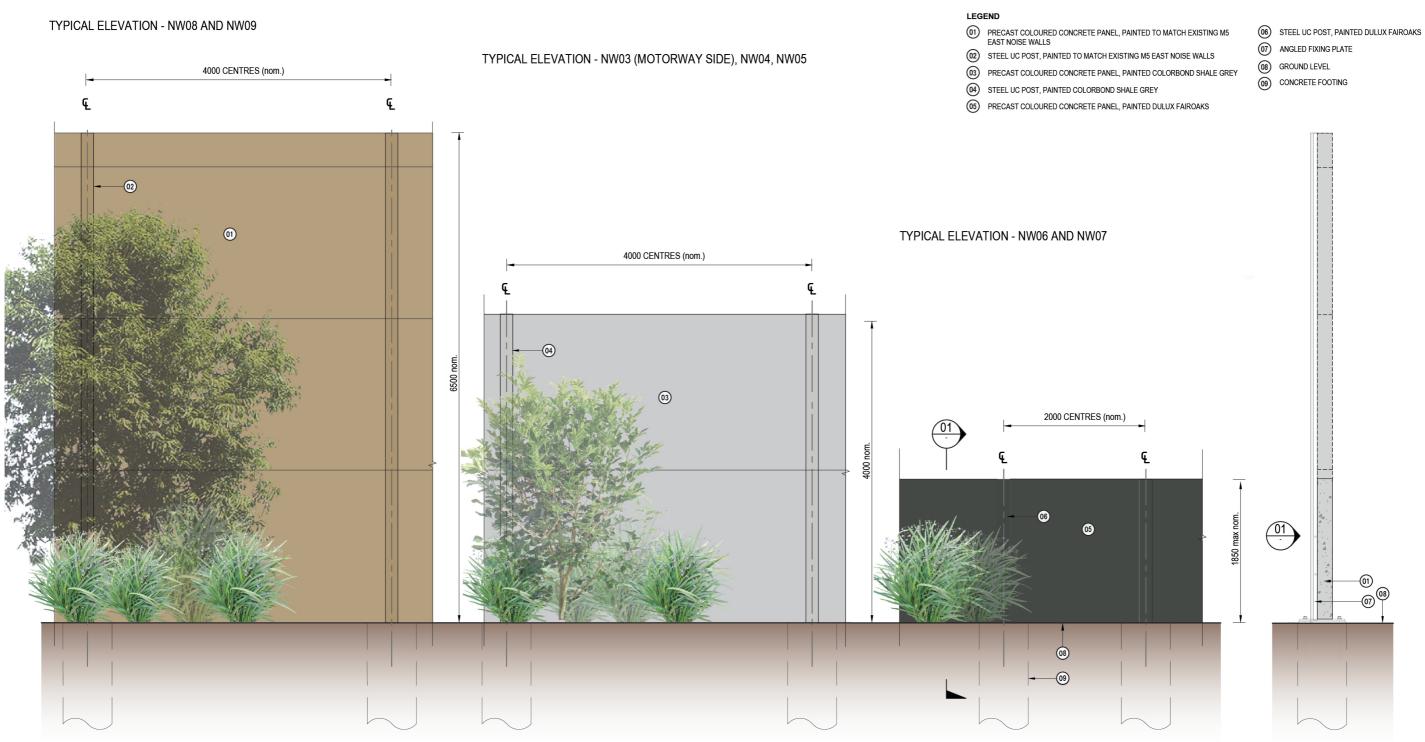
Noise Walls - Typical details - Precast concrete panel - Type 2B
